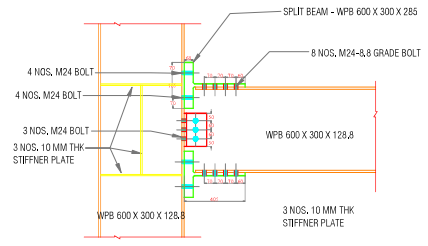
DETAILS OF BEAM TO BEAM SHEAR CONNECTION
